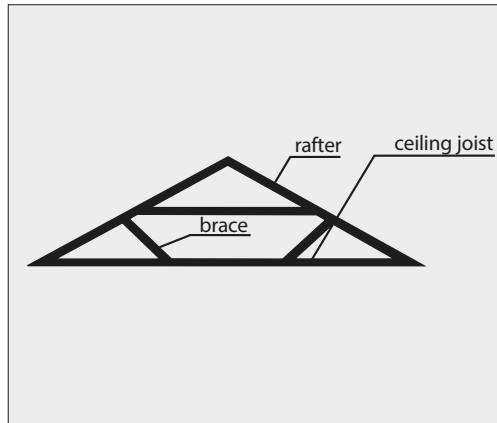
Typical construction of the roof with braces connected to the ceiling joists.
